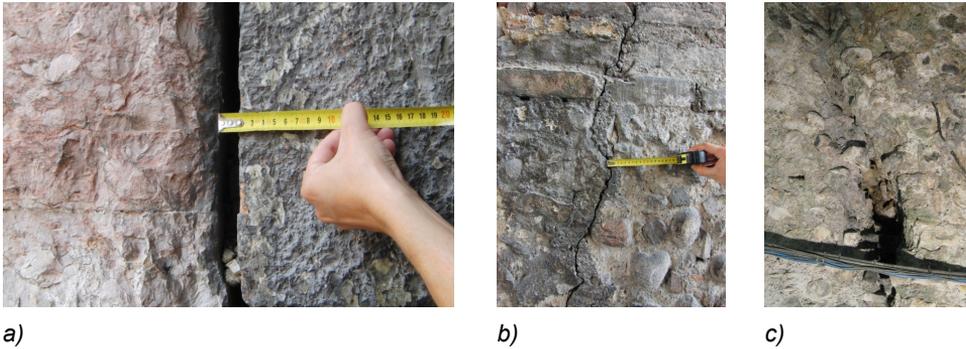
Crack and damage pattern survey: a) detachment of the external layer of squared blocks masonry; b) Cracks on the inner radial walls; c) local damages on vaults caused by rainwater infiltrations.
